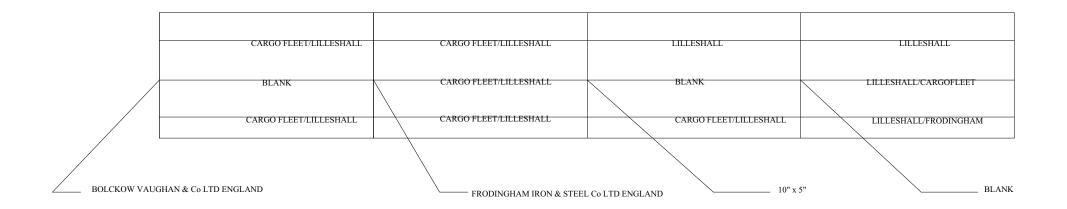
Schematic plan view of Third Floor showing sources of steelwork
